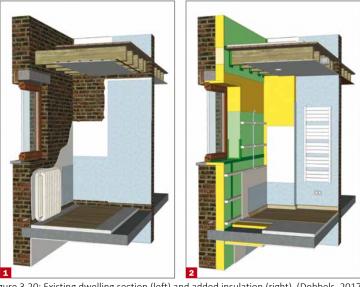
Existing dwelling section (left) and added insulation (right) (Dobbels, 2017)
